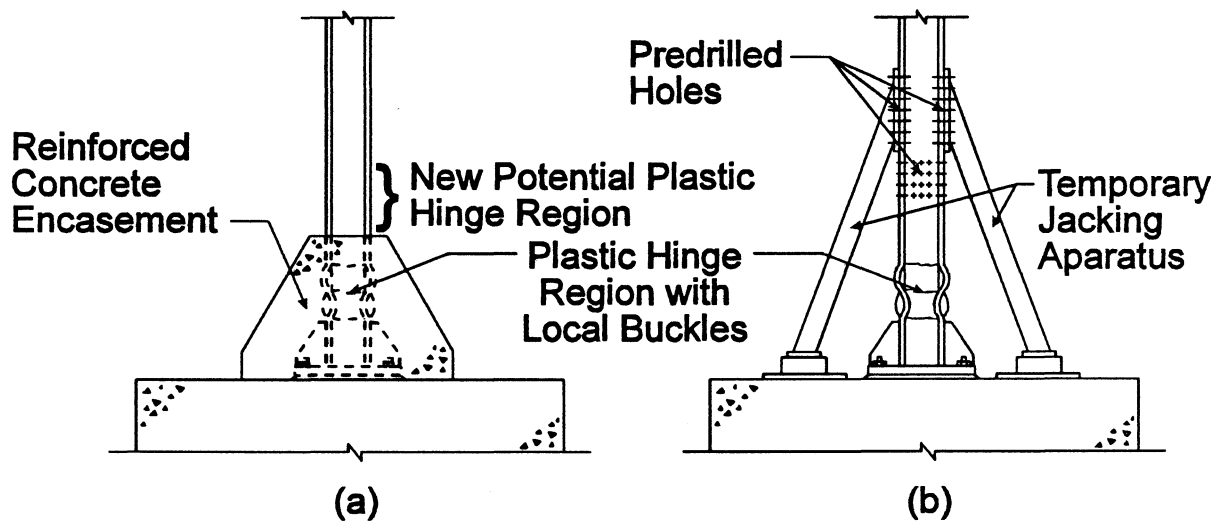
Potential column base plastic hinge repair/replacement strategies
